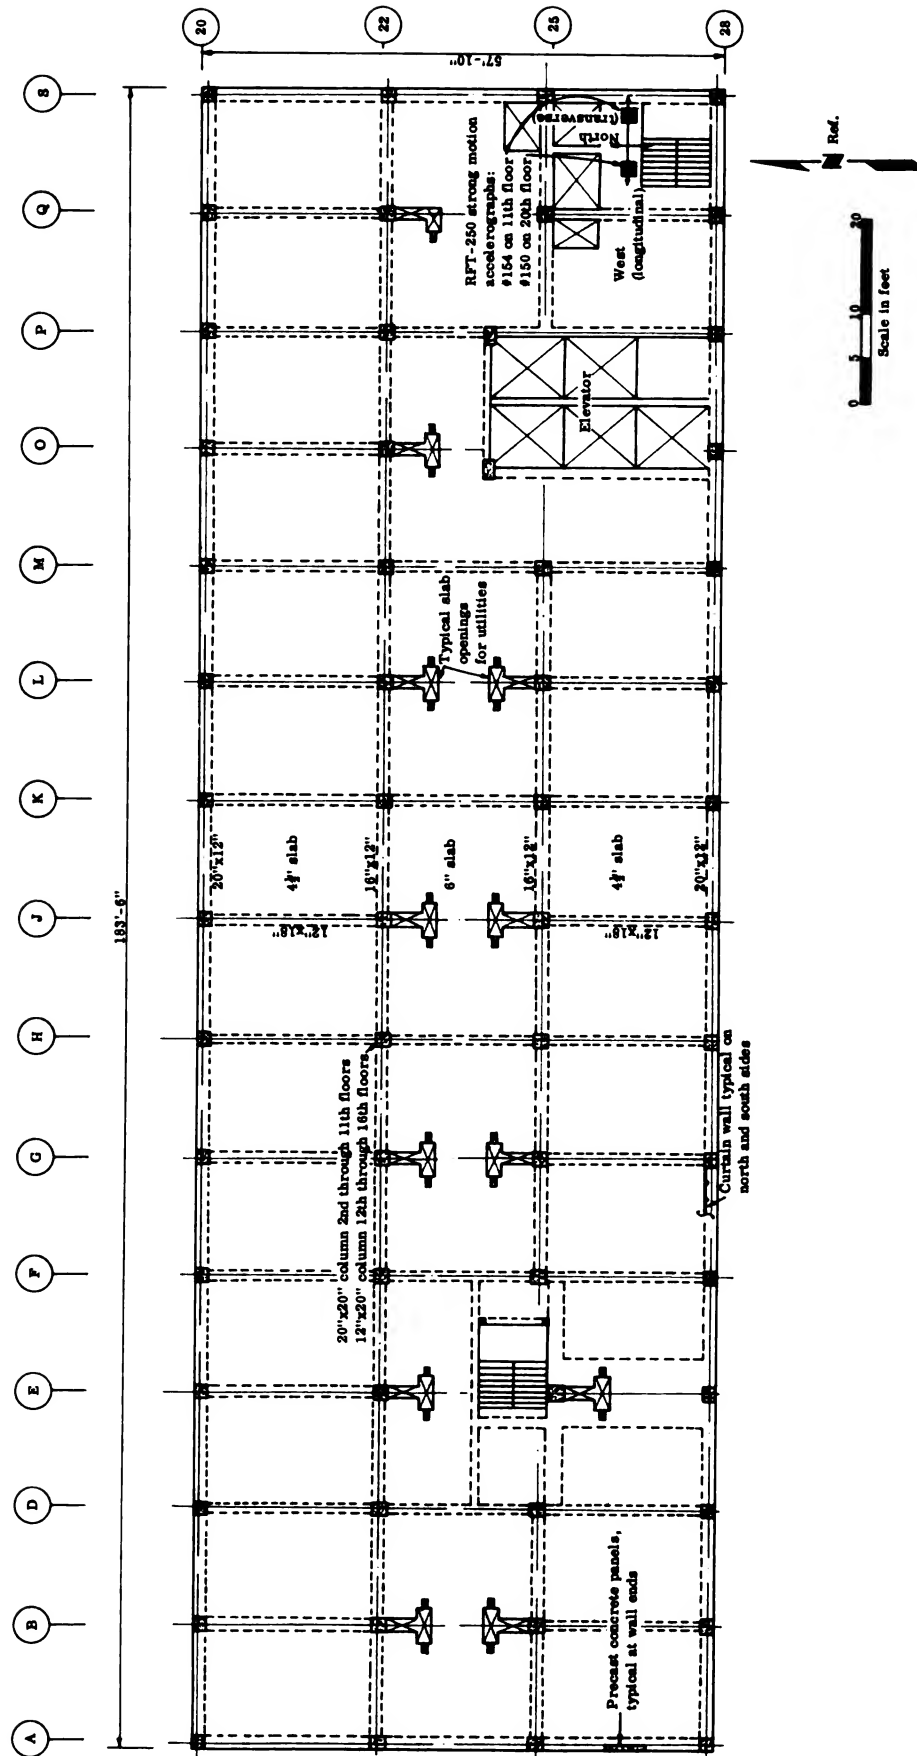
Sheraton-Universal Hotel. Typical floor framing plan.
